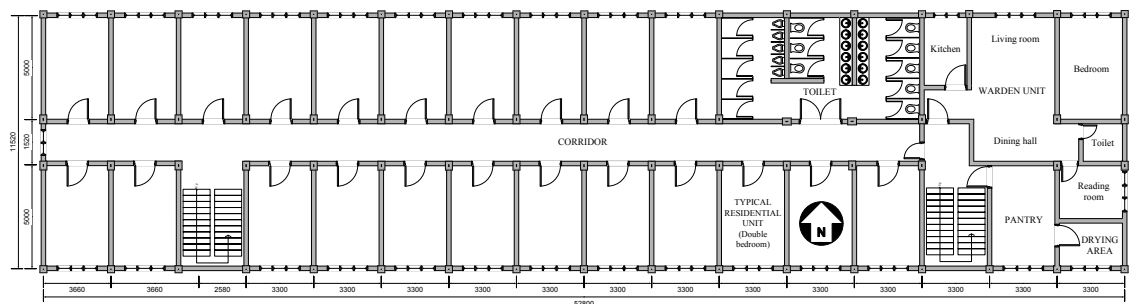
Floor plan of 1st RC (new additional residential block - Block D & E)
